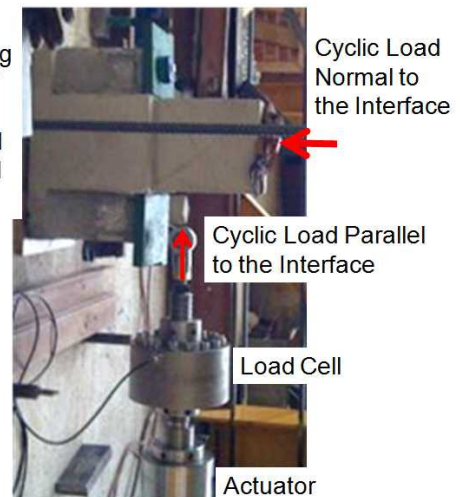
Loading arrangement of the specimen representing portion of encased R/C panel and the jacketed column
